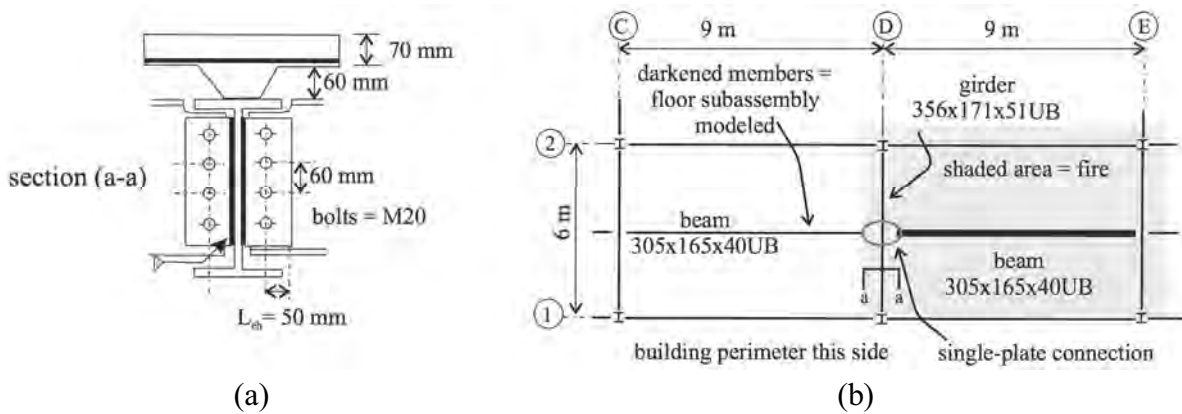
Details of Cardington building test: (a) single plate connection and (b) the heated building compartment (the modeled beam with thick lines)
